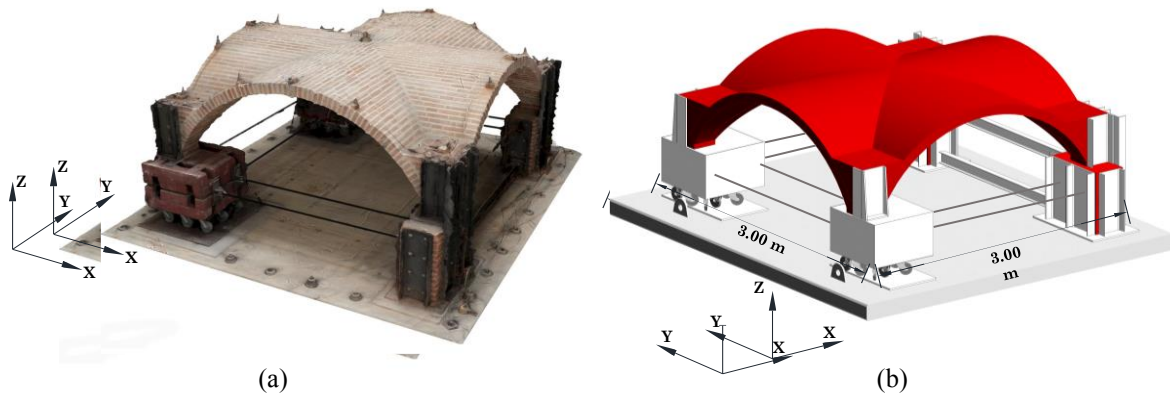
Unstrengthened masonry cross vault: (a) plan and (b) isometric views [21].
